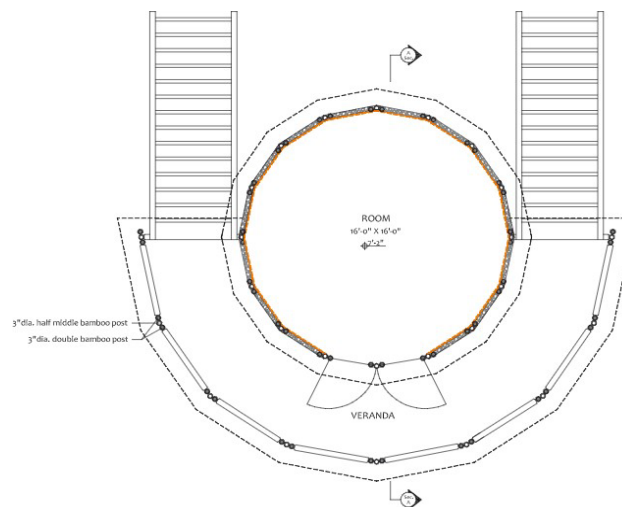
Architectural Plan (Arch Daily Vernacular Architecture)
